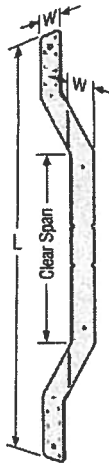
LFTA LIGHT FLOOR TIE ANCHOR
